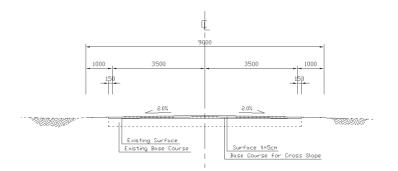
Typical Cross Section (Section E1 & F1)
